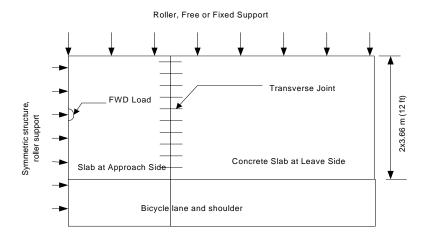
Plan View of Pavement Model Used in Boundary Evaluation
